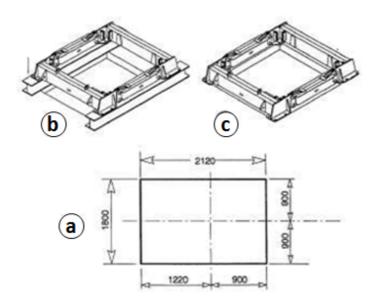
Installing Climbing Collar Steps: (a) The collar width and collar mounted on the support beam in Figure 9.2 (b)
